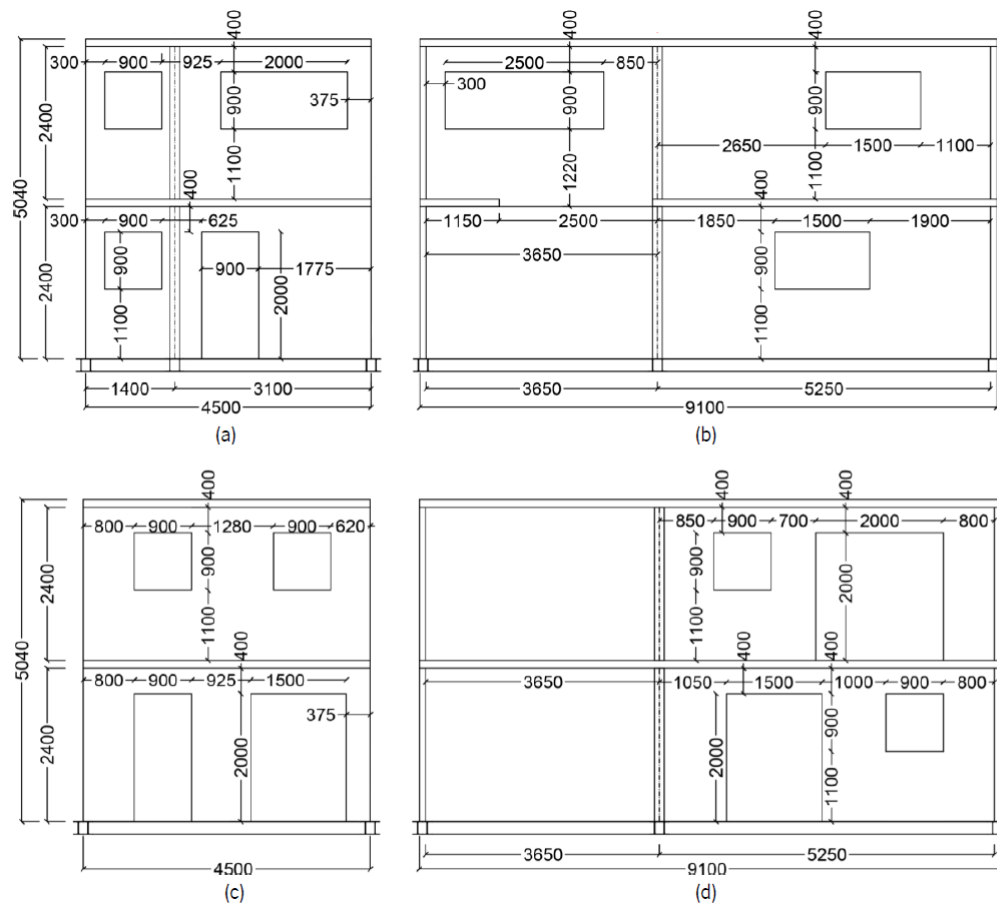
Building façades (dimensions in mm). (a) AA' façade; (b) CC' façade; (c) BB' façade; and (d) DD' façade.
